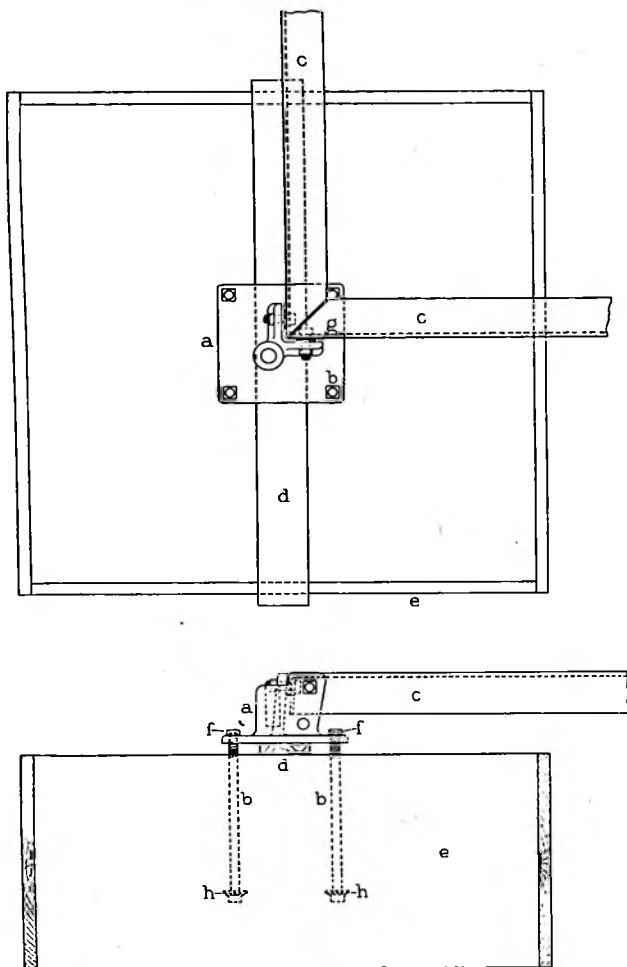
Tower base and footing, ready for pouring concrete.
